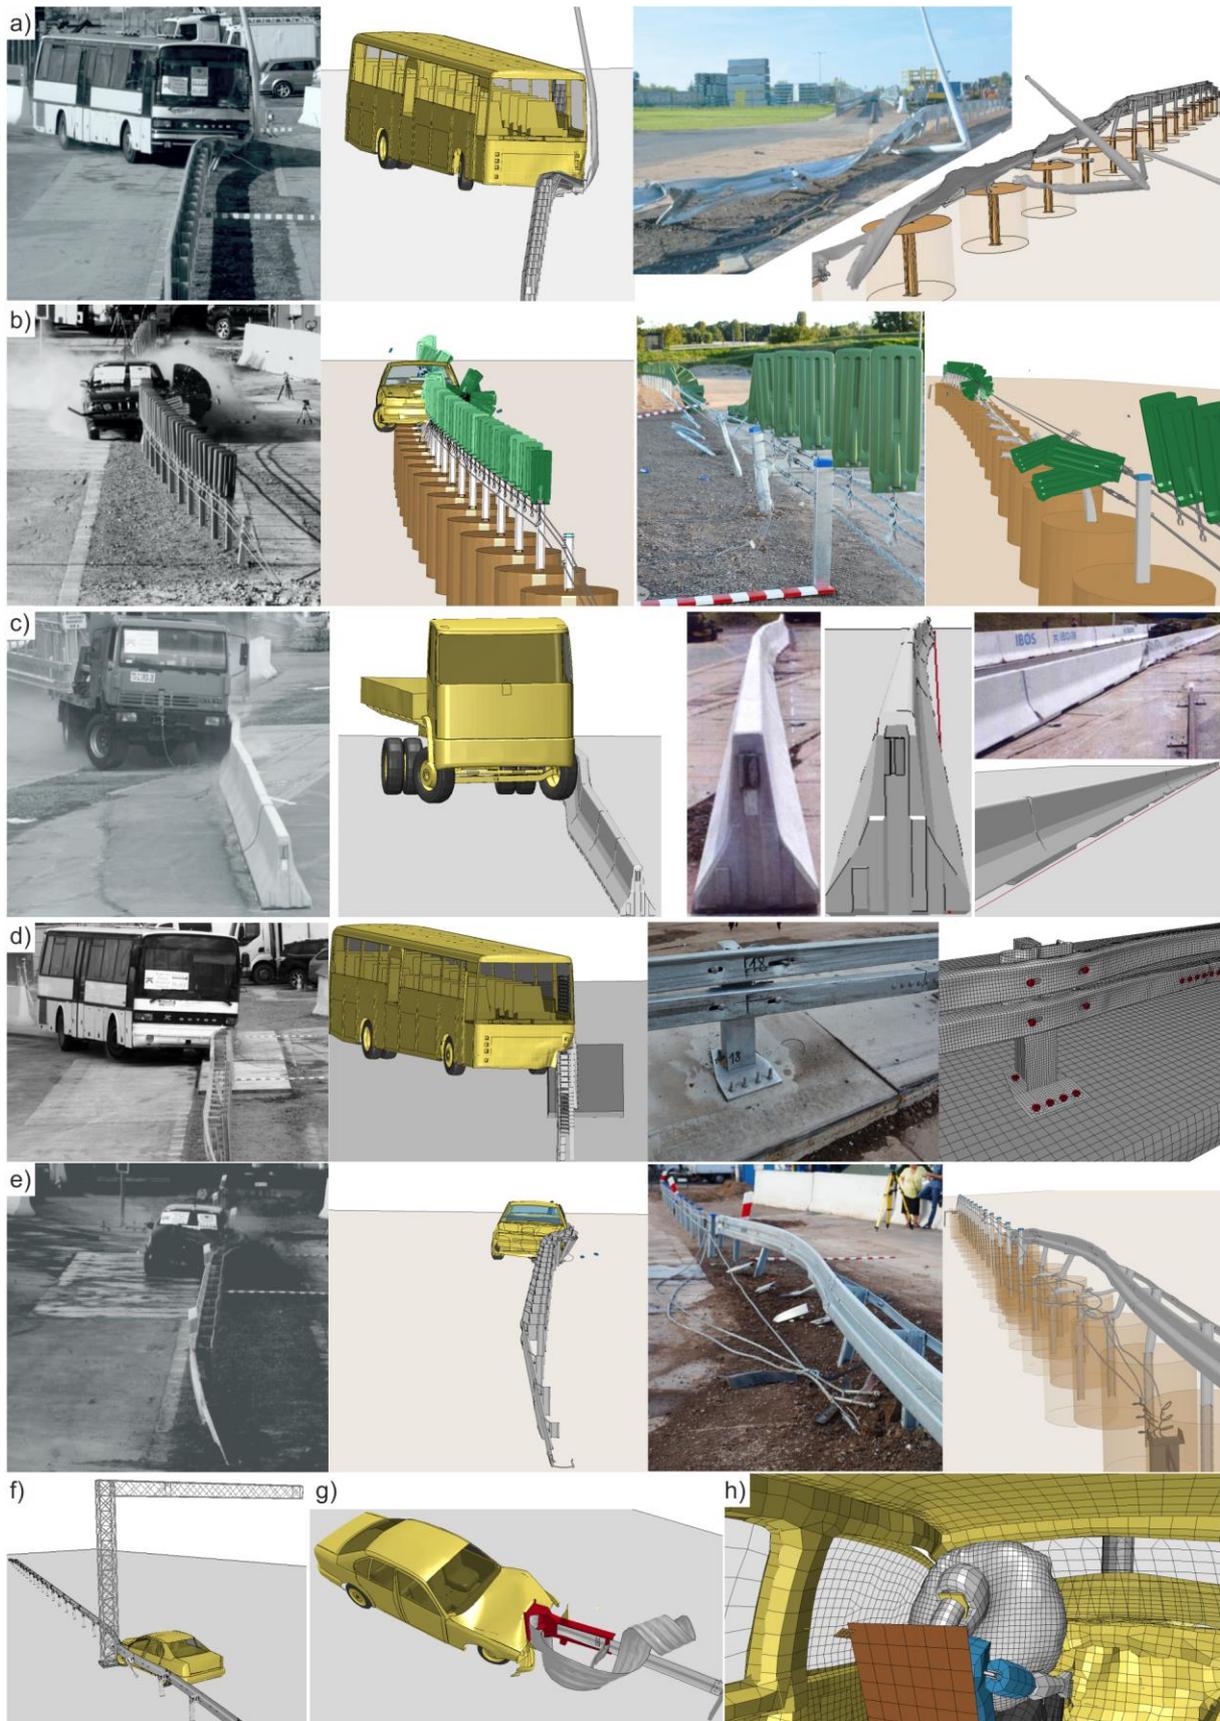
Examples of simulations in RID 3A and RID 3B projects: a) TB51 test with lighting columns within working width, b) TB32 test, c) concrete barrier TB41, d) bridge barrier TB51, e) transition – cable and steel barrier TB32, f) steel barrier TB32 with gantry, g) guardrail end terminal, h) dummy inside Geo Metro car hitting obstacle.
